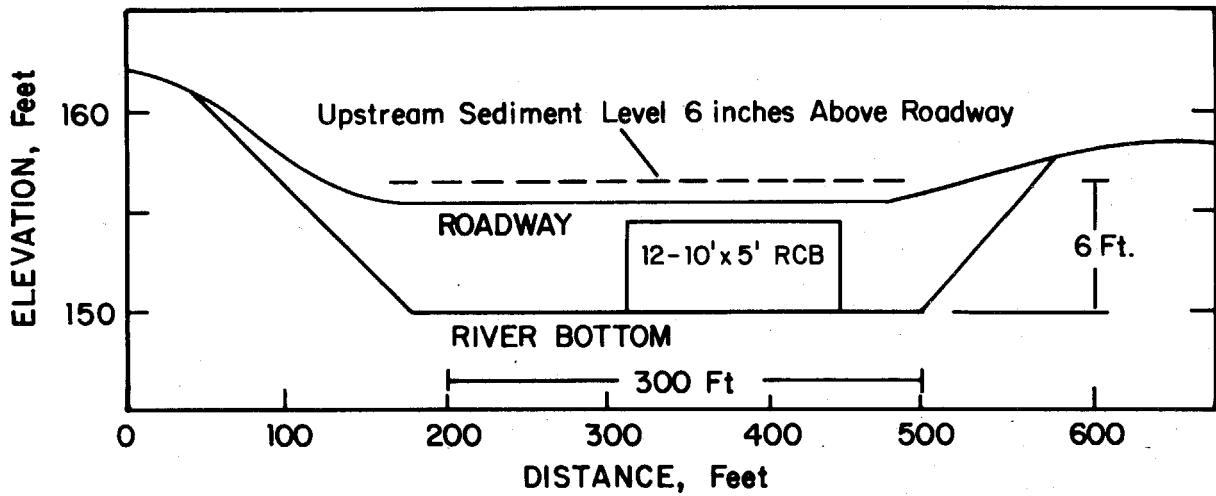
A Cross section at the damaged location on Olive Hill Road of the San Luis Rey River.
